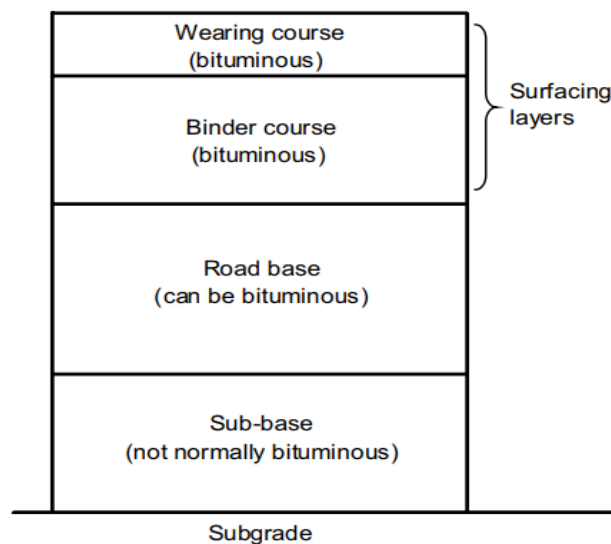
Pavement layers (UK Department for International Development, 2002)
